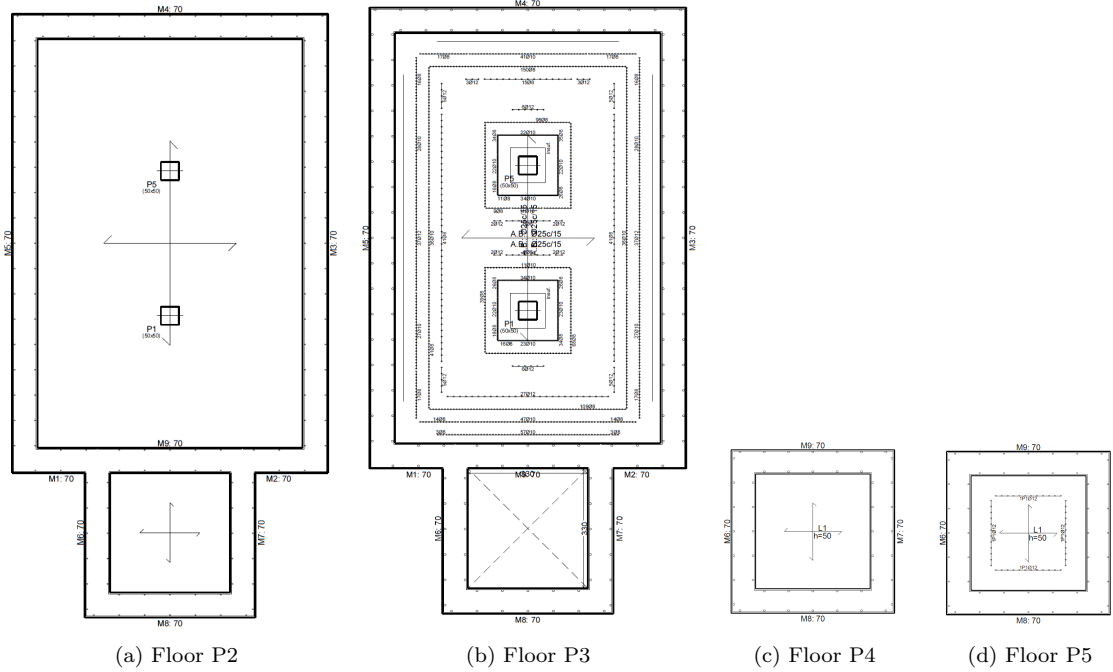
Slab Reinforcement of the project floors P2-P5. Floor P1 is not added because it represents the foundations, it does not contain an horizontal slab.
